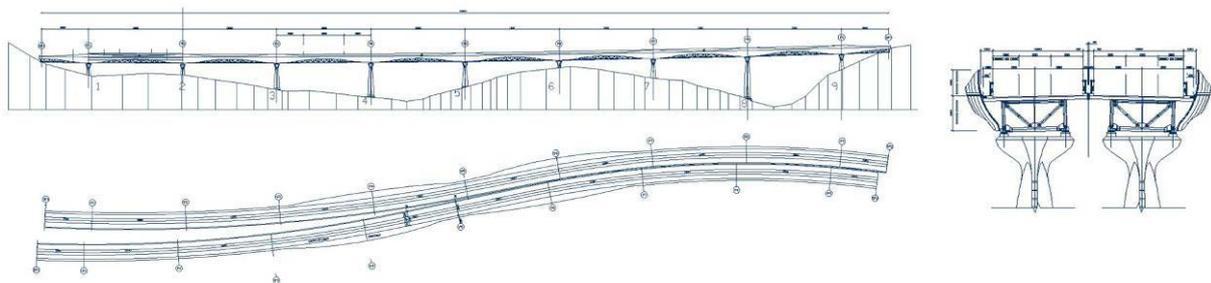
Li Cuponeddi viaduct: plan, elevation and section
